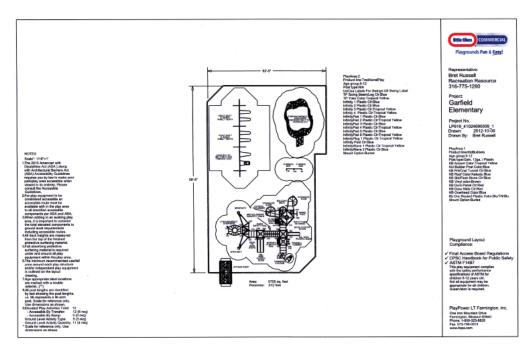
First through Fifth Grade Stationary Play Equipment Plan
